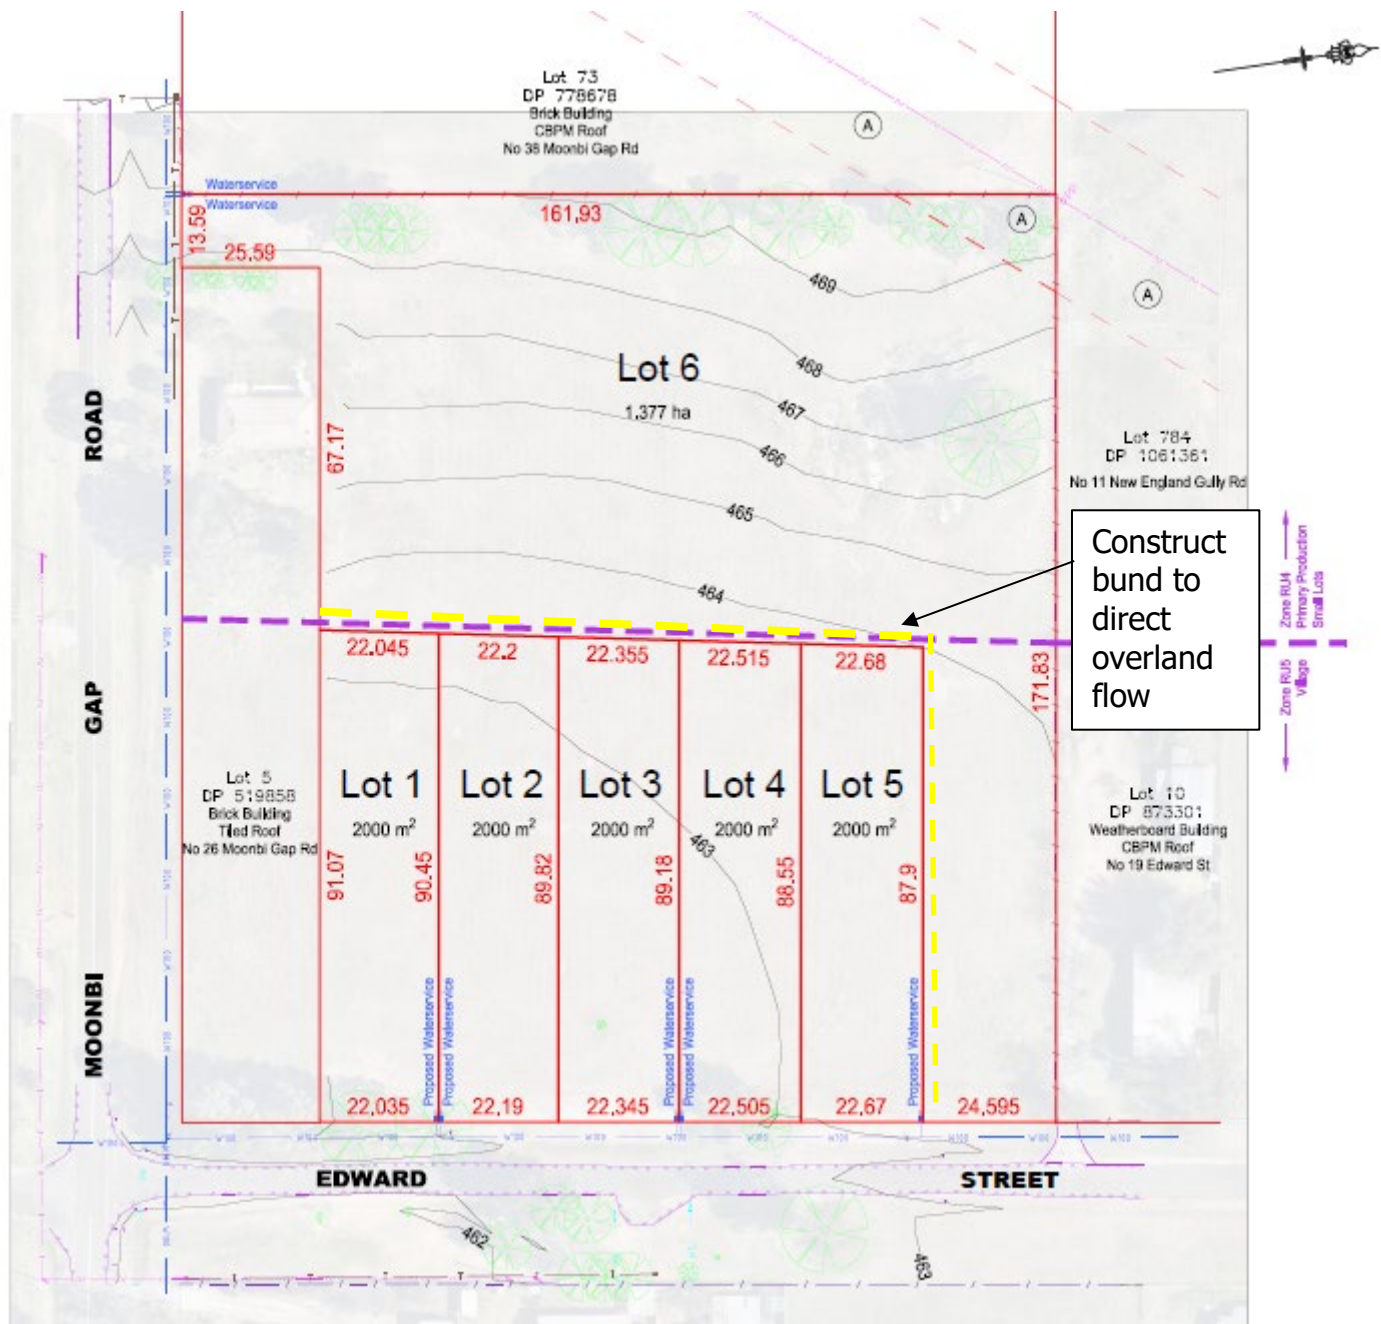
Proposed Stormwater Bund on Detailed Survey and Proposed Lot Layout
